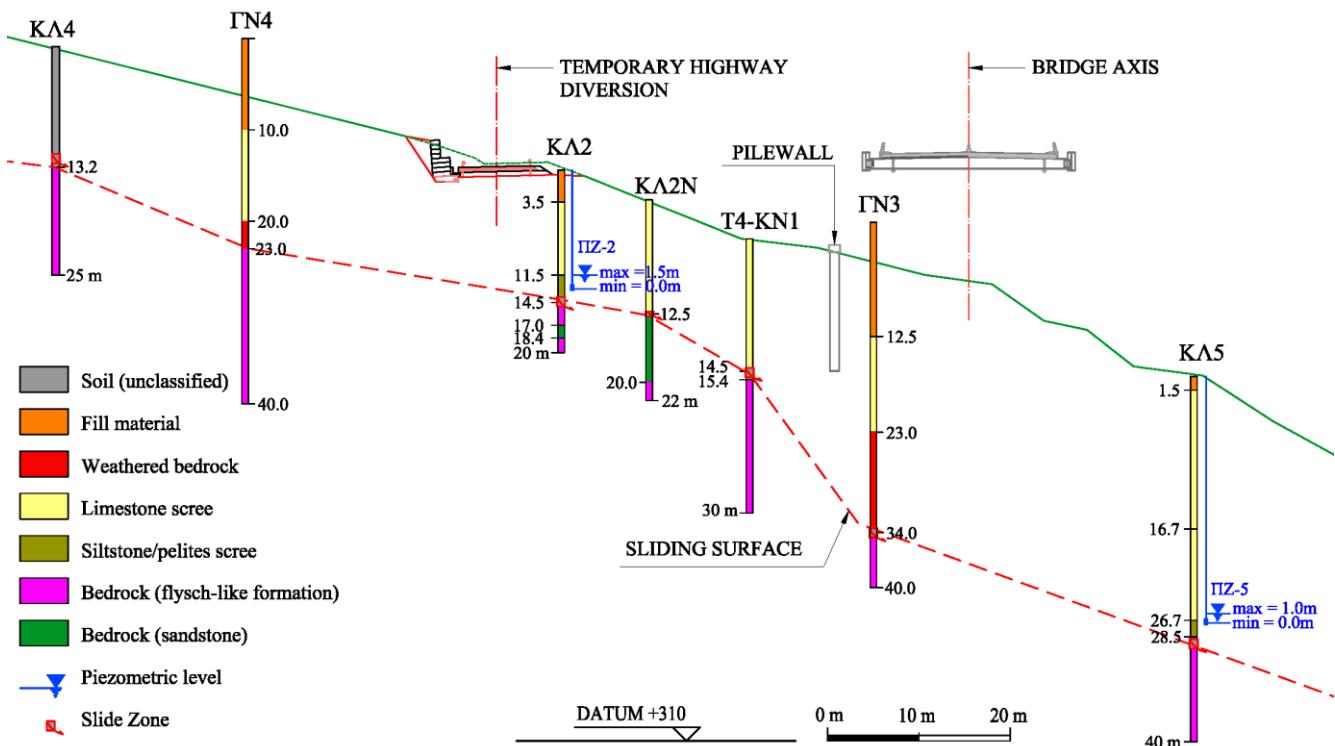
Section in between Piers II2 and II3 showing the position of the geotechnical instruments with respect to the bedrock surface.
